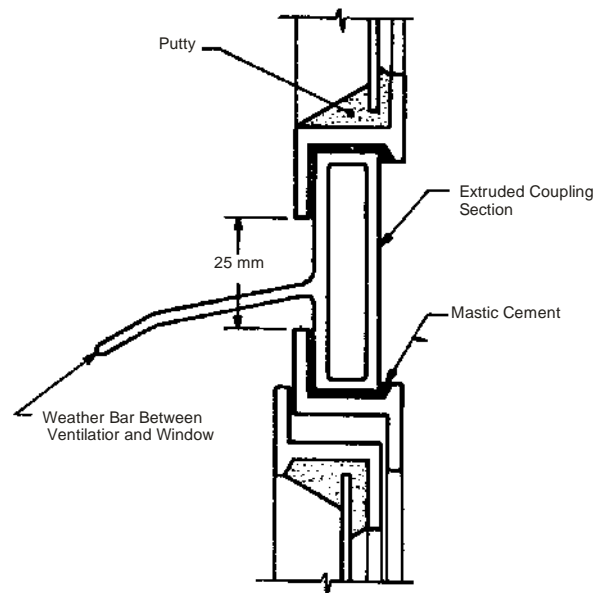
Coupling Section Extruded having Weather Bar Fitted with Ventilators on top of Windows
